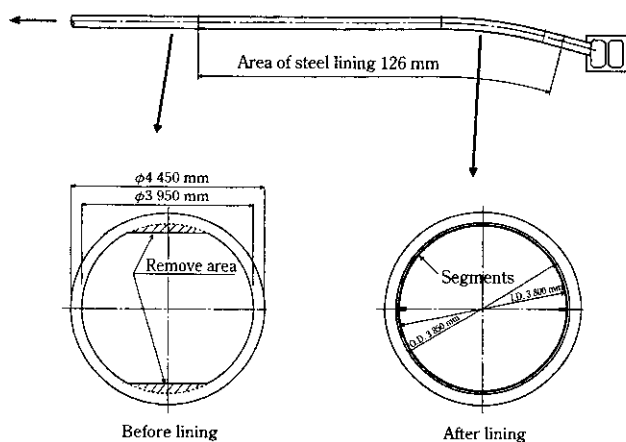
Working diagram of Steel Lining for a NTT shield tunnel in Osaka
